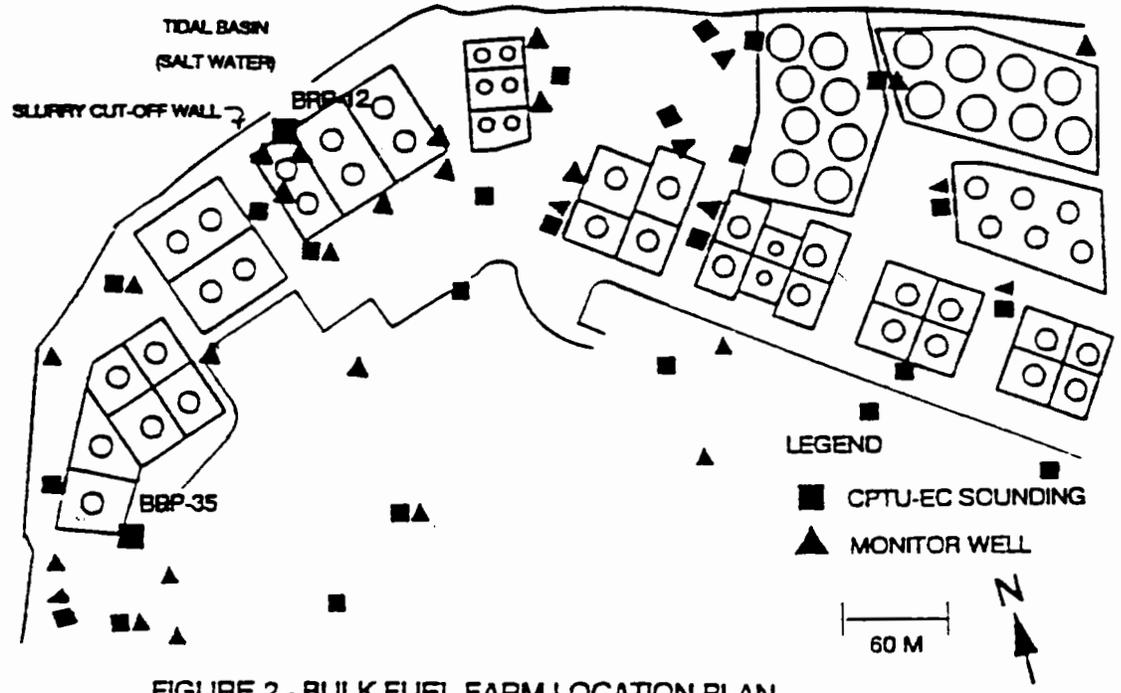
BULK FUEL FARM LOCATION PLAN
